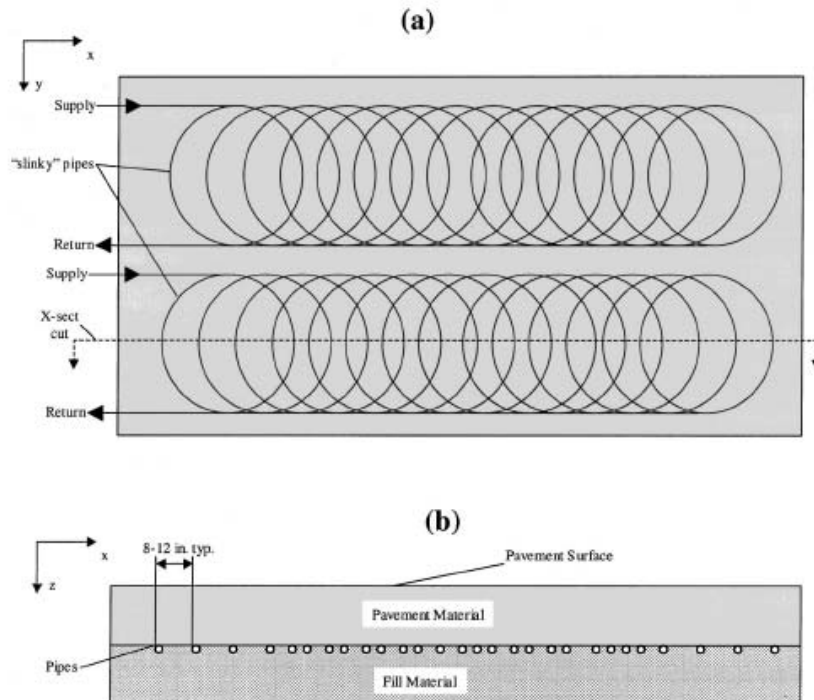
Slinky pipe configuration in a hydronically-heated pavement slab in (a) plan view and (b) cross-sectional view along the slinky centerline
